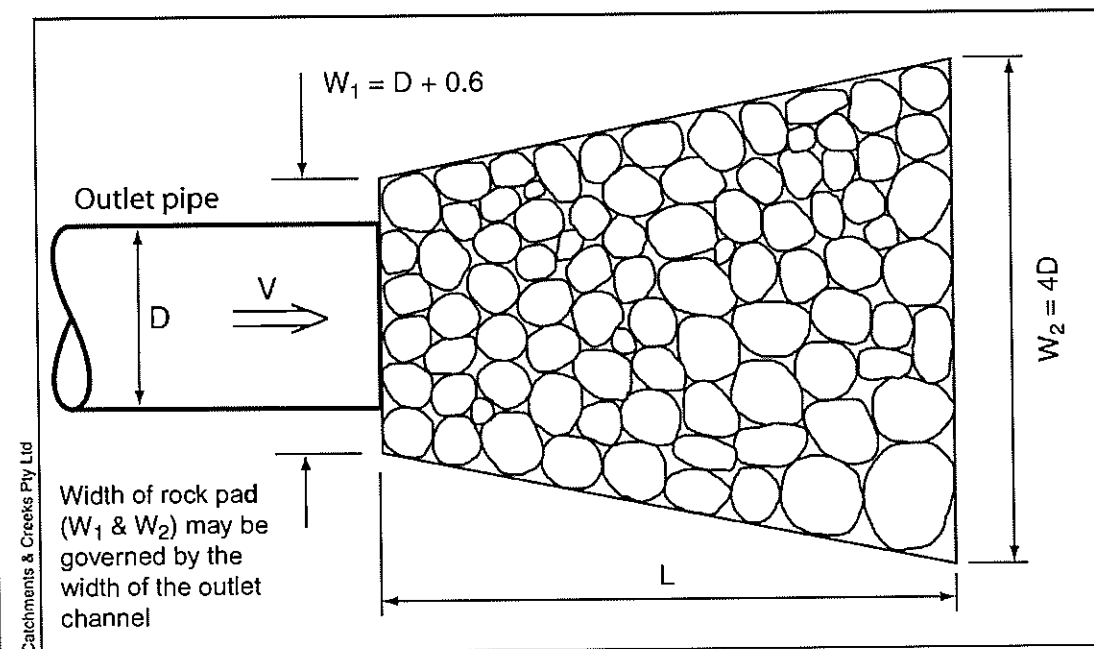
Typical layout of a rock pad for a single pipe outlet (plan view)
